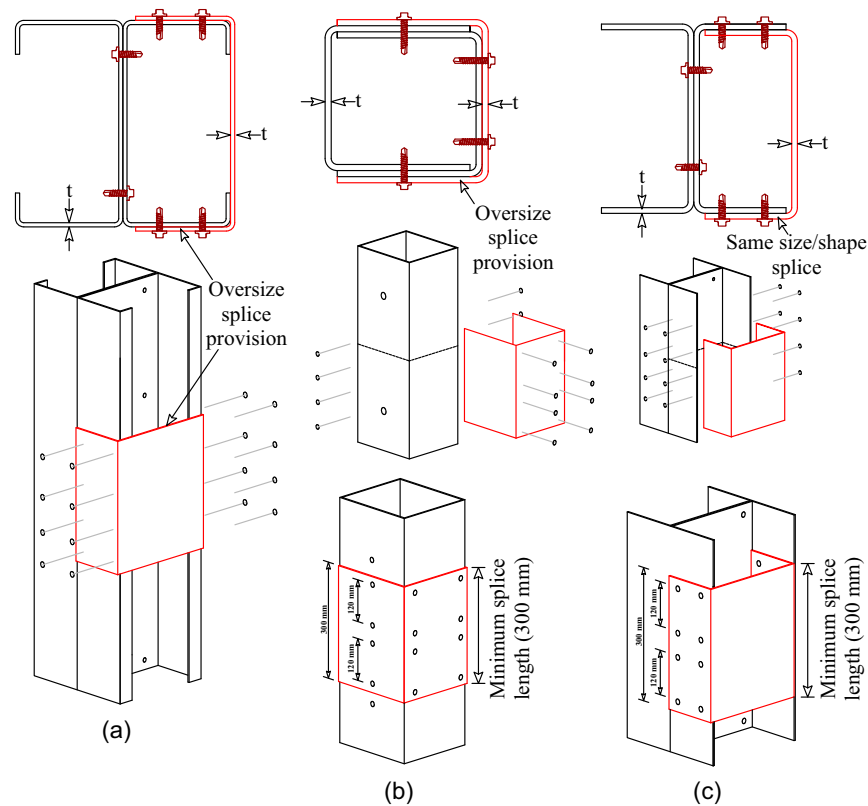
Recommendations for the splice configuration in column-to-column connections in built up column assembly.
